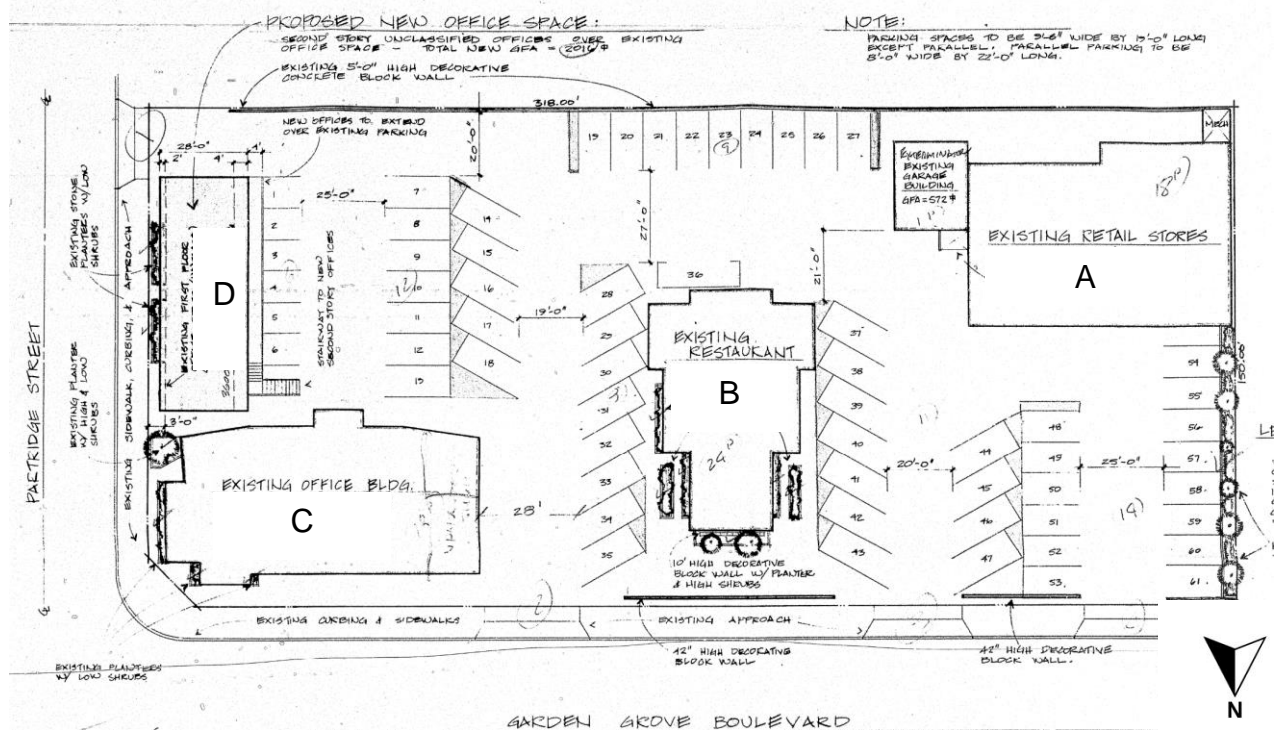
The approved site plan under Site Plan No. SP-161-78 shows four buildings on-site.
